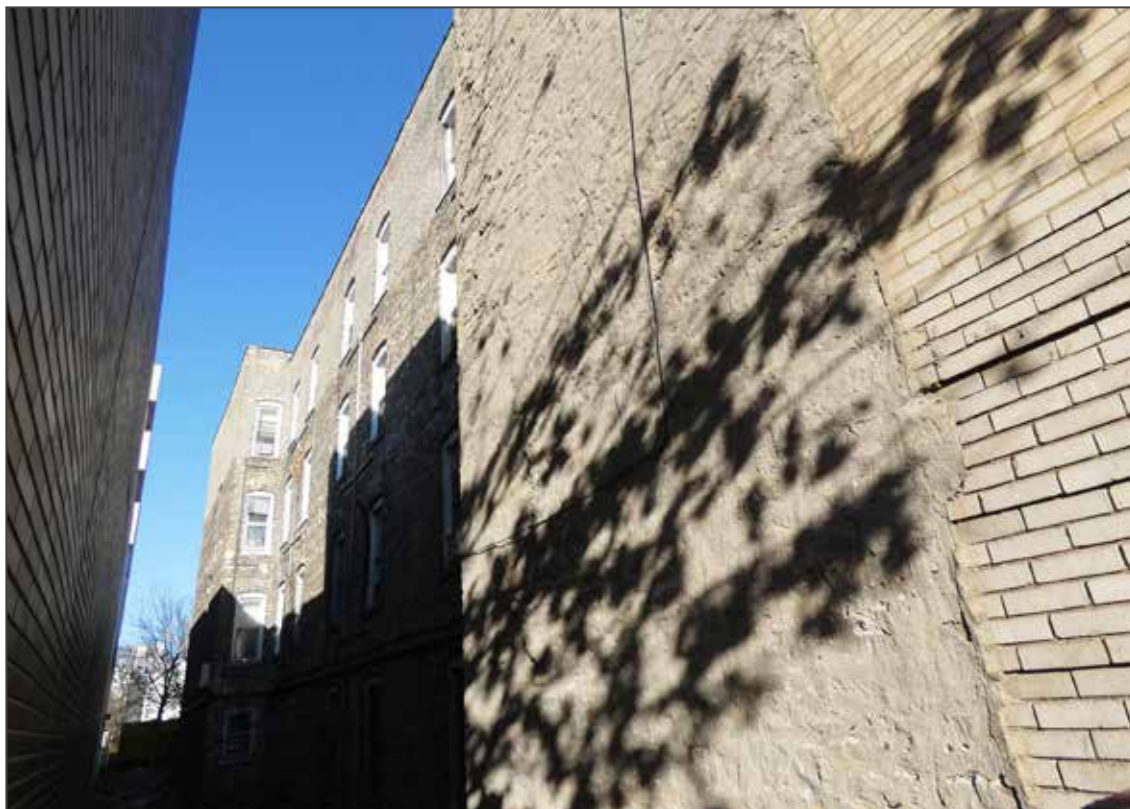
of 15. West facade, looking north from Jackson Boulevard.
